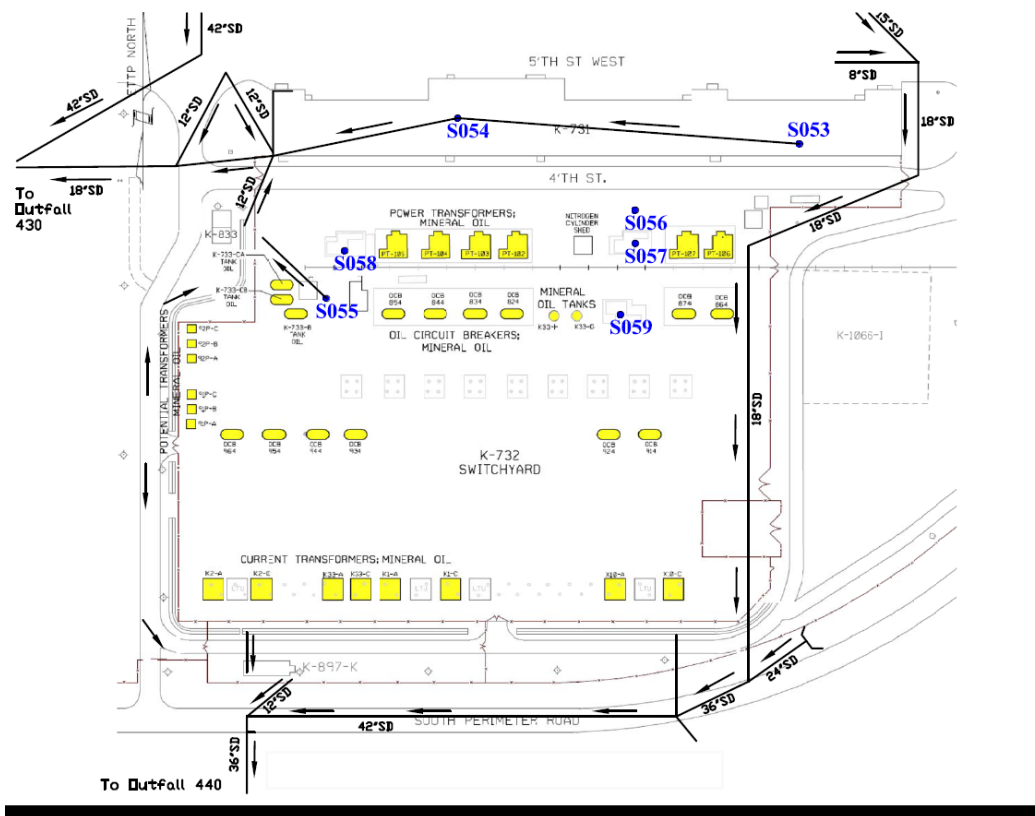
K-731 Switch House and K-732 Switchyard Drainage System.
